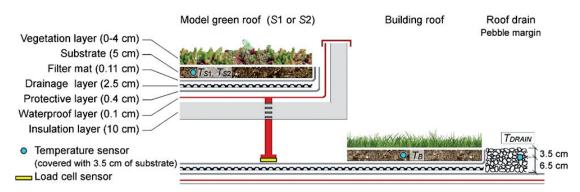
Typical cross-section of the green roof segment and its surroundings at the experimental site
